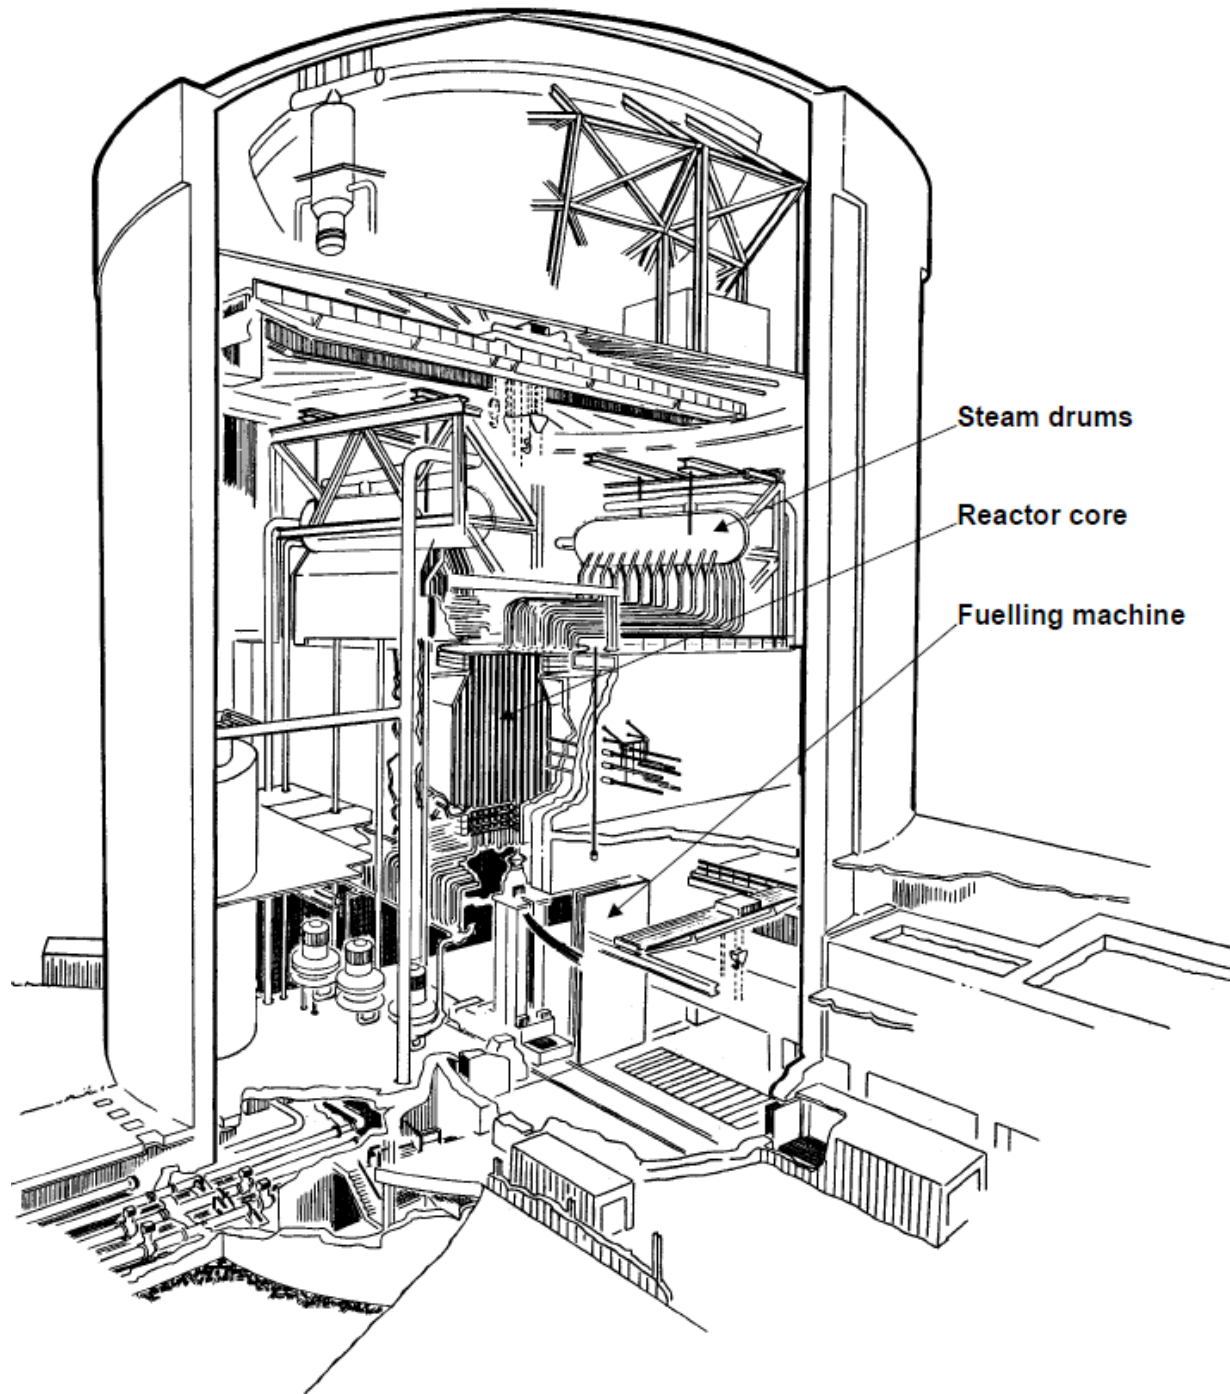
Reactor Building (viewing towards North-West) (CNL 2023)
